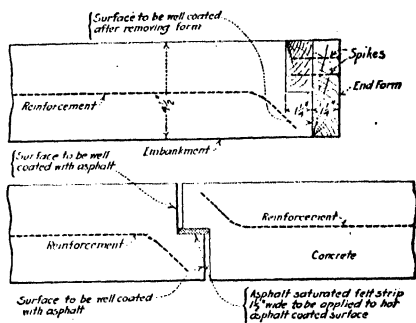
Expansion joint, floor of Vancouver Reservoir.
